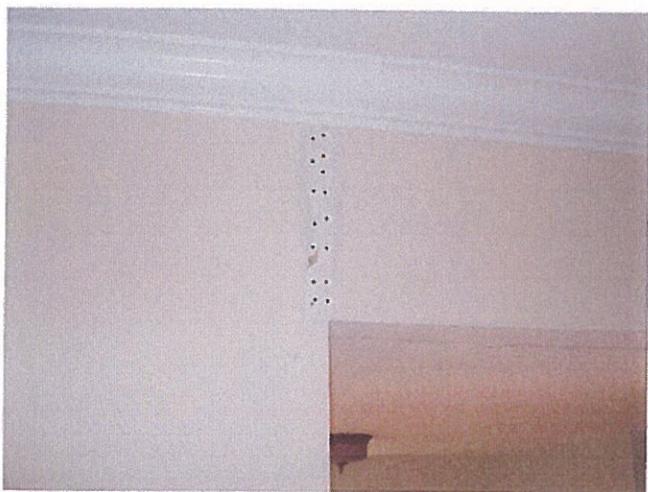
" continued cracking in walls and ceiling, bedroom #2
